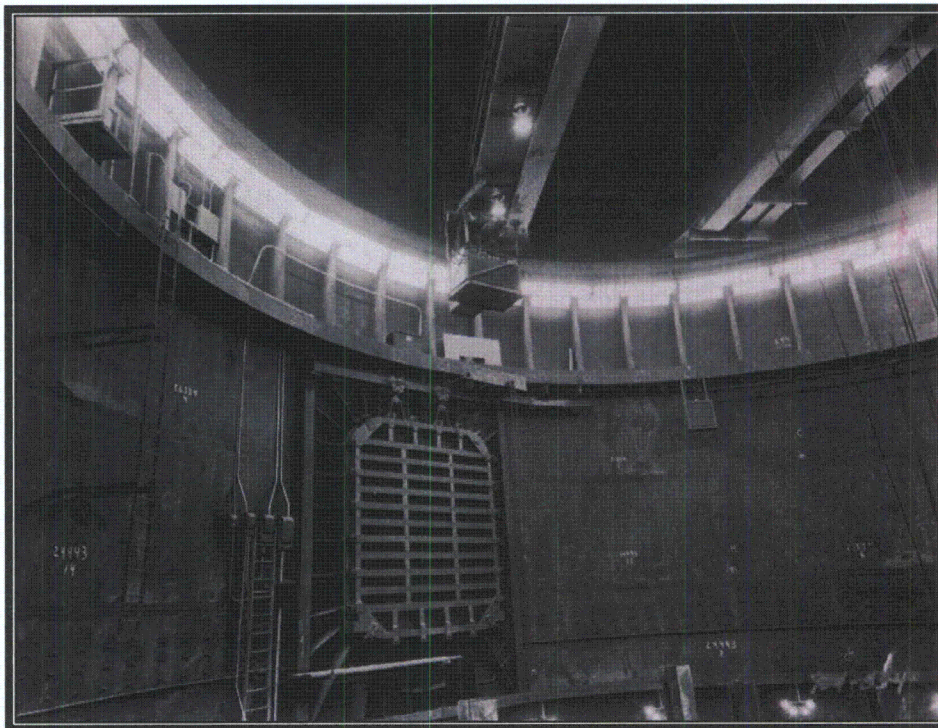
Equipment door in reactor building, note absence of concrete operating floor (Courtesy DECo)
